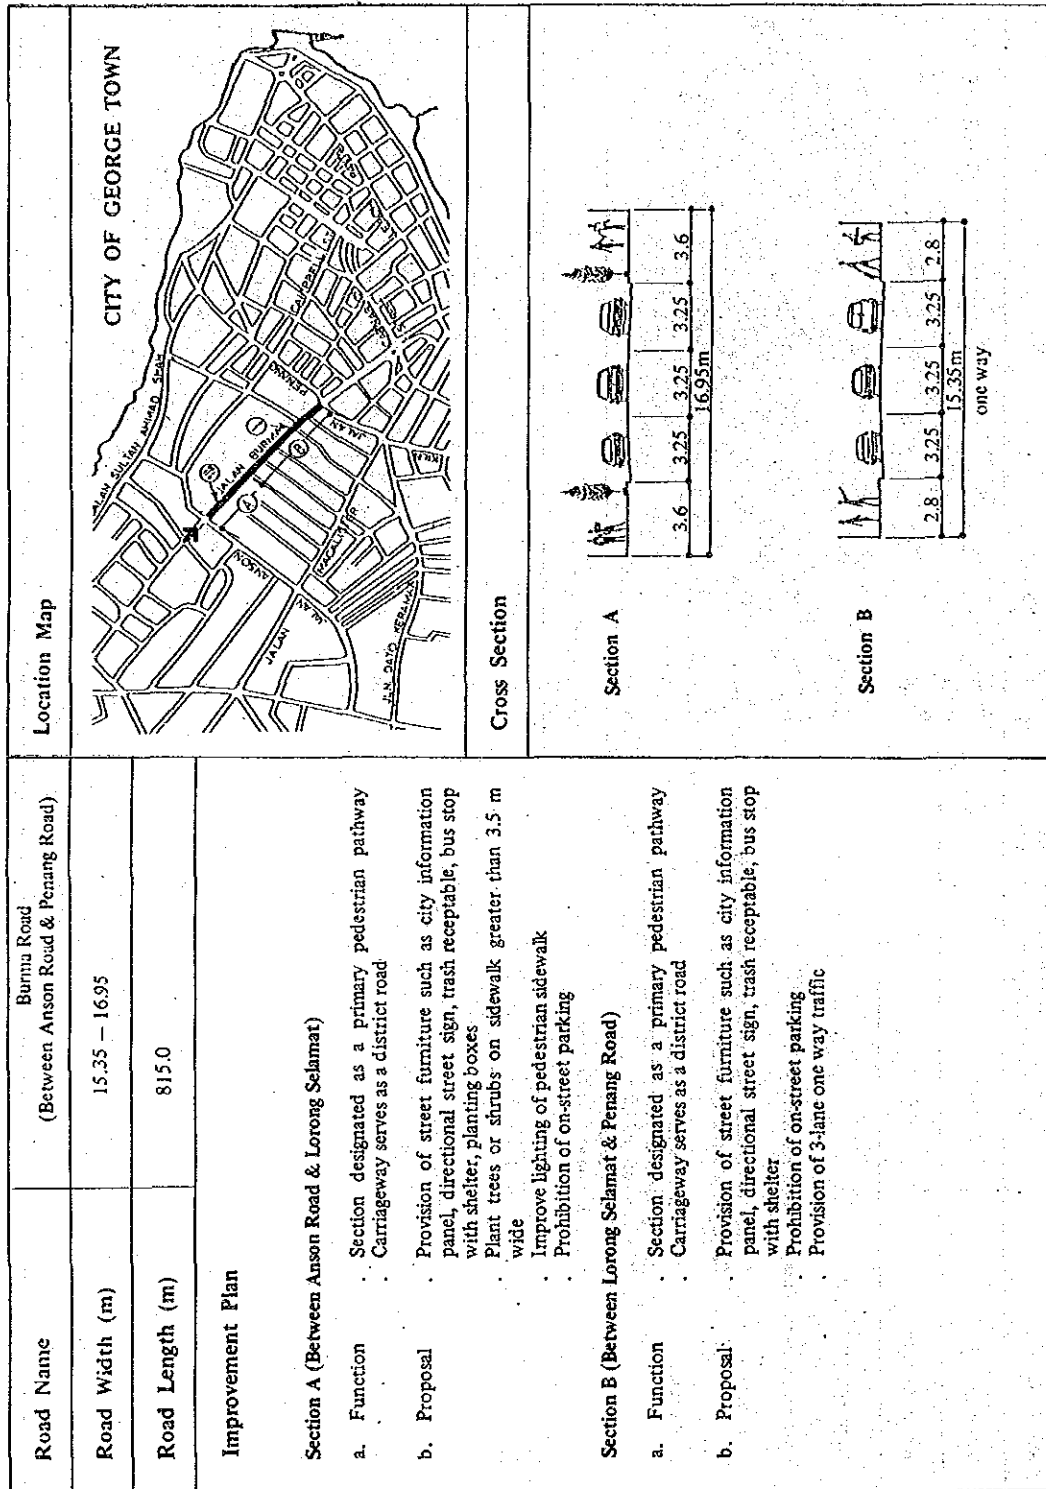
Pedestrianisation Improvement Plan (S) – Burma Road
